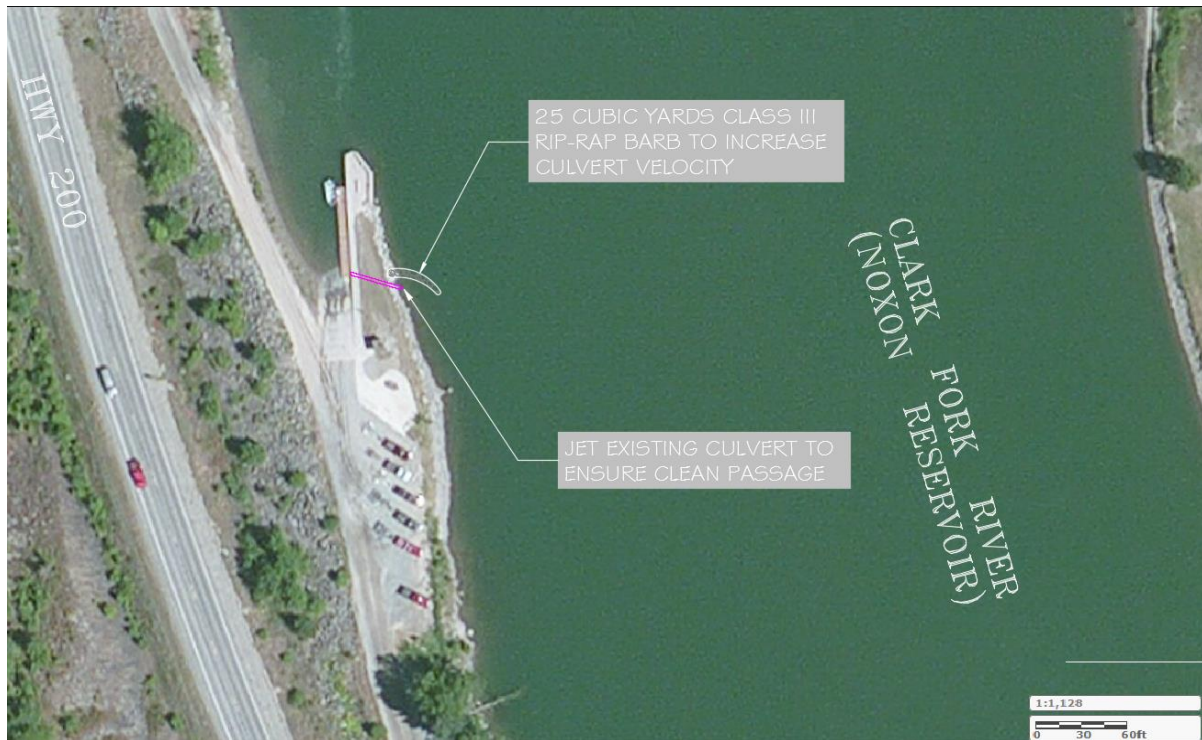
Flat Iron Ridge Fishing Access Site proposed ramp improvements.
